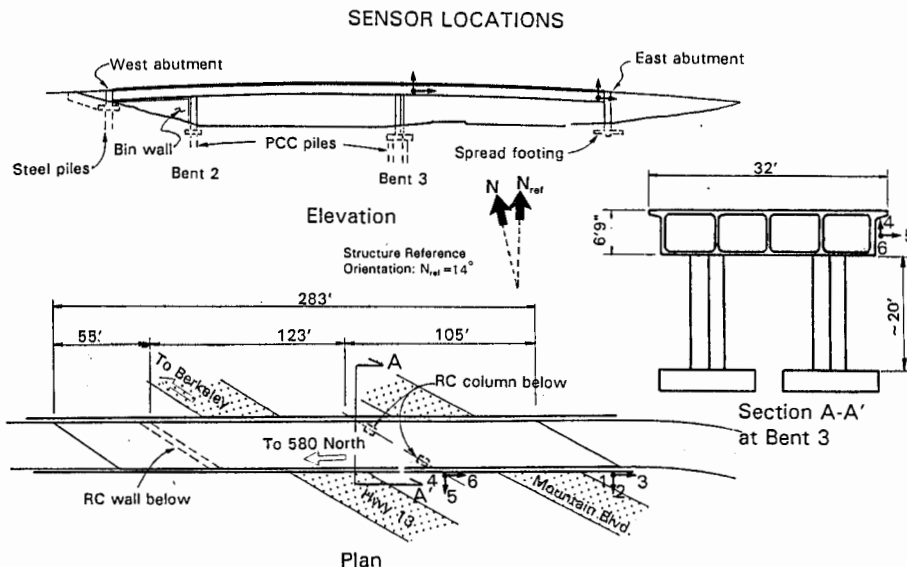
Sensor locations on Highway 580/13 Interchange Bridge in Oakland, which is an example of a light instrumentation plan.
